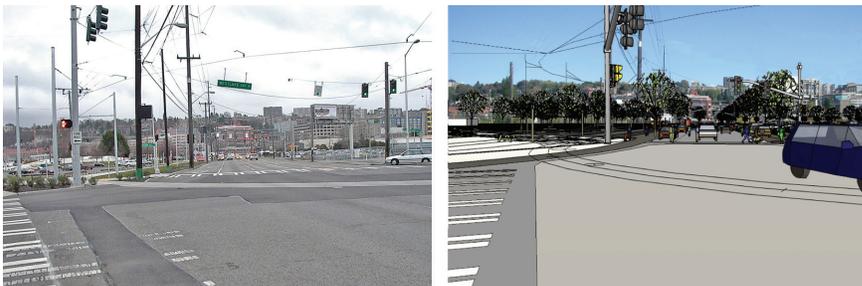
Viewpoint Looking East on Valley Street at Westlake Avenue – Existing and Visual Simulation
